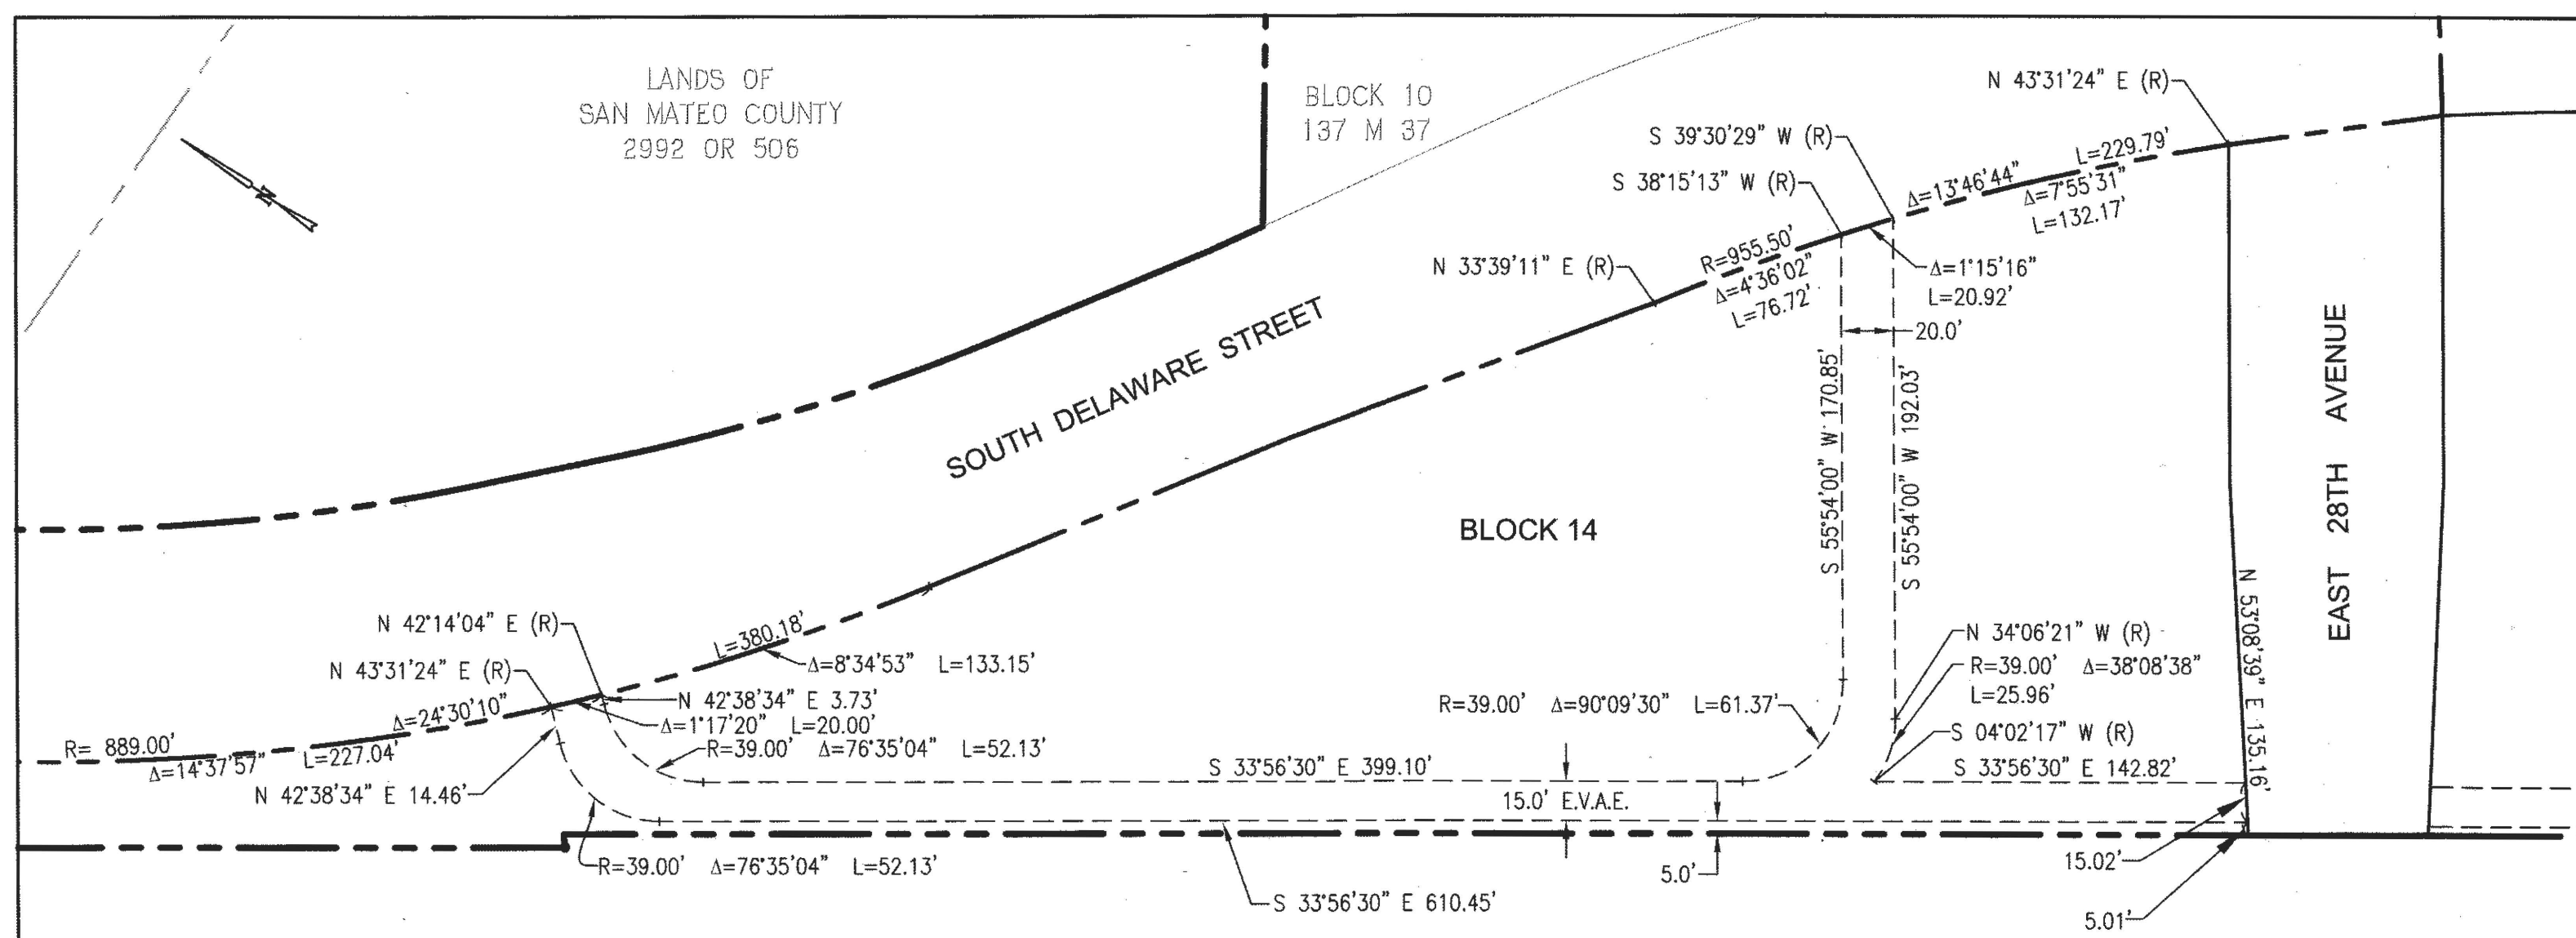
DETAIL 'A' - PUBLIC ACCESS EASEMENT (P.A.E.)
